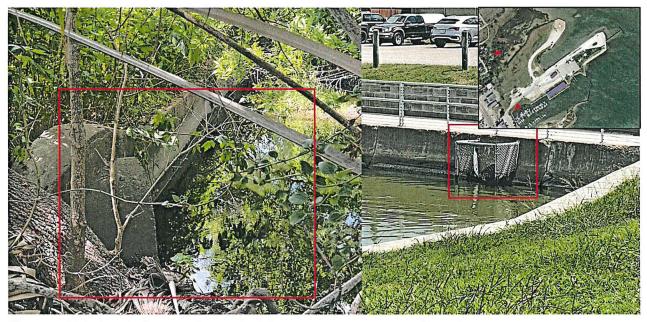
Existing drainage culverts draining the northwest part of Port Lavaca.
